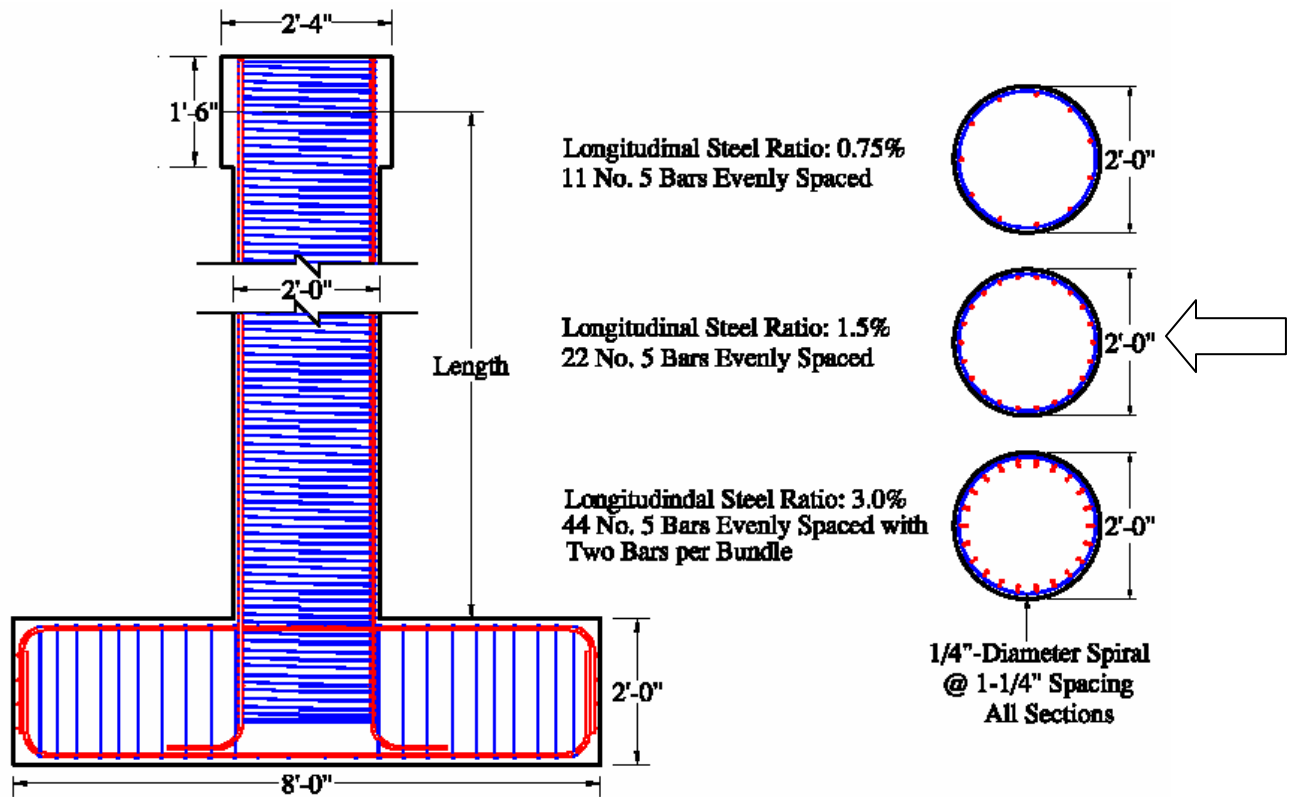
Specimen Geometry and Reinforcement of the Lehman column. (Lehman, 2000)
